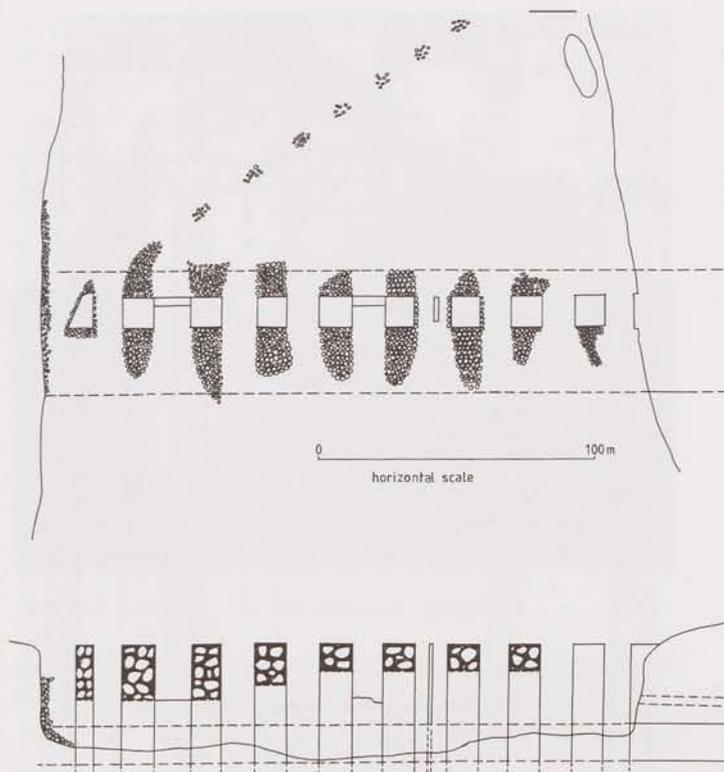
Jisr al-Sidd* (No. 67). Plan and section of bridge.
